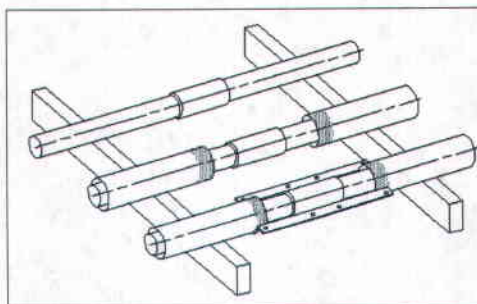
During layout, bonding and inspection, support the piping on 2x4 blocks to keep the joints clean and to keep bedding out of the pipe. Remove supports before burial
